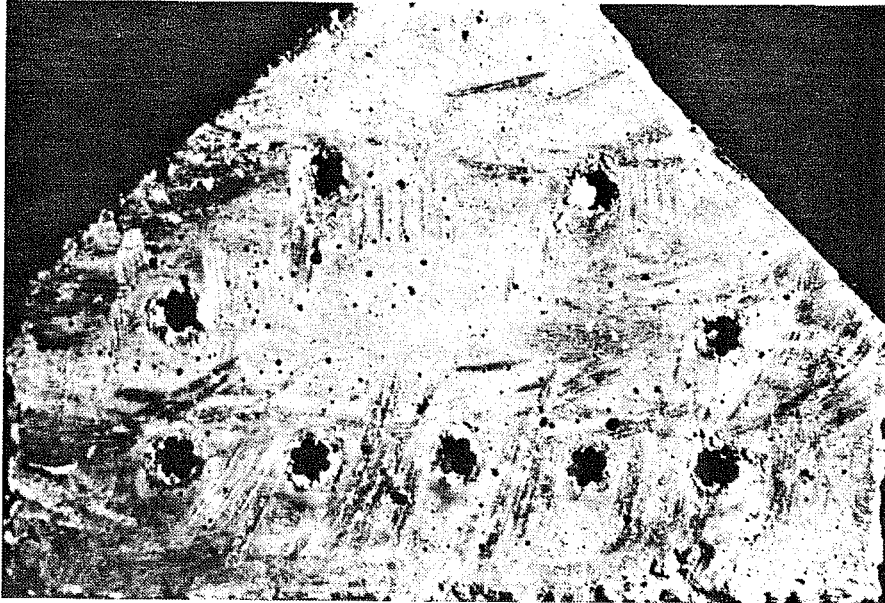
Photograph of strand slip after shear failure - north end, Specimen 1
